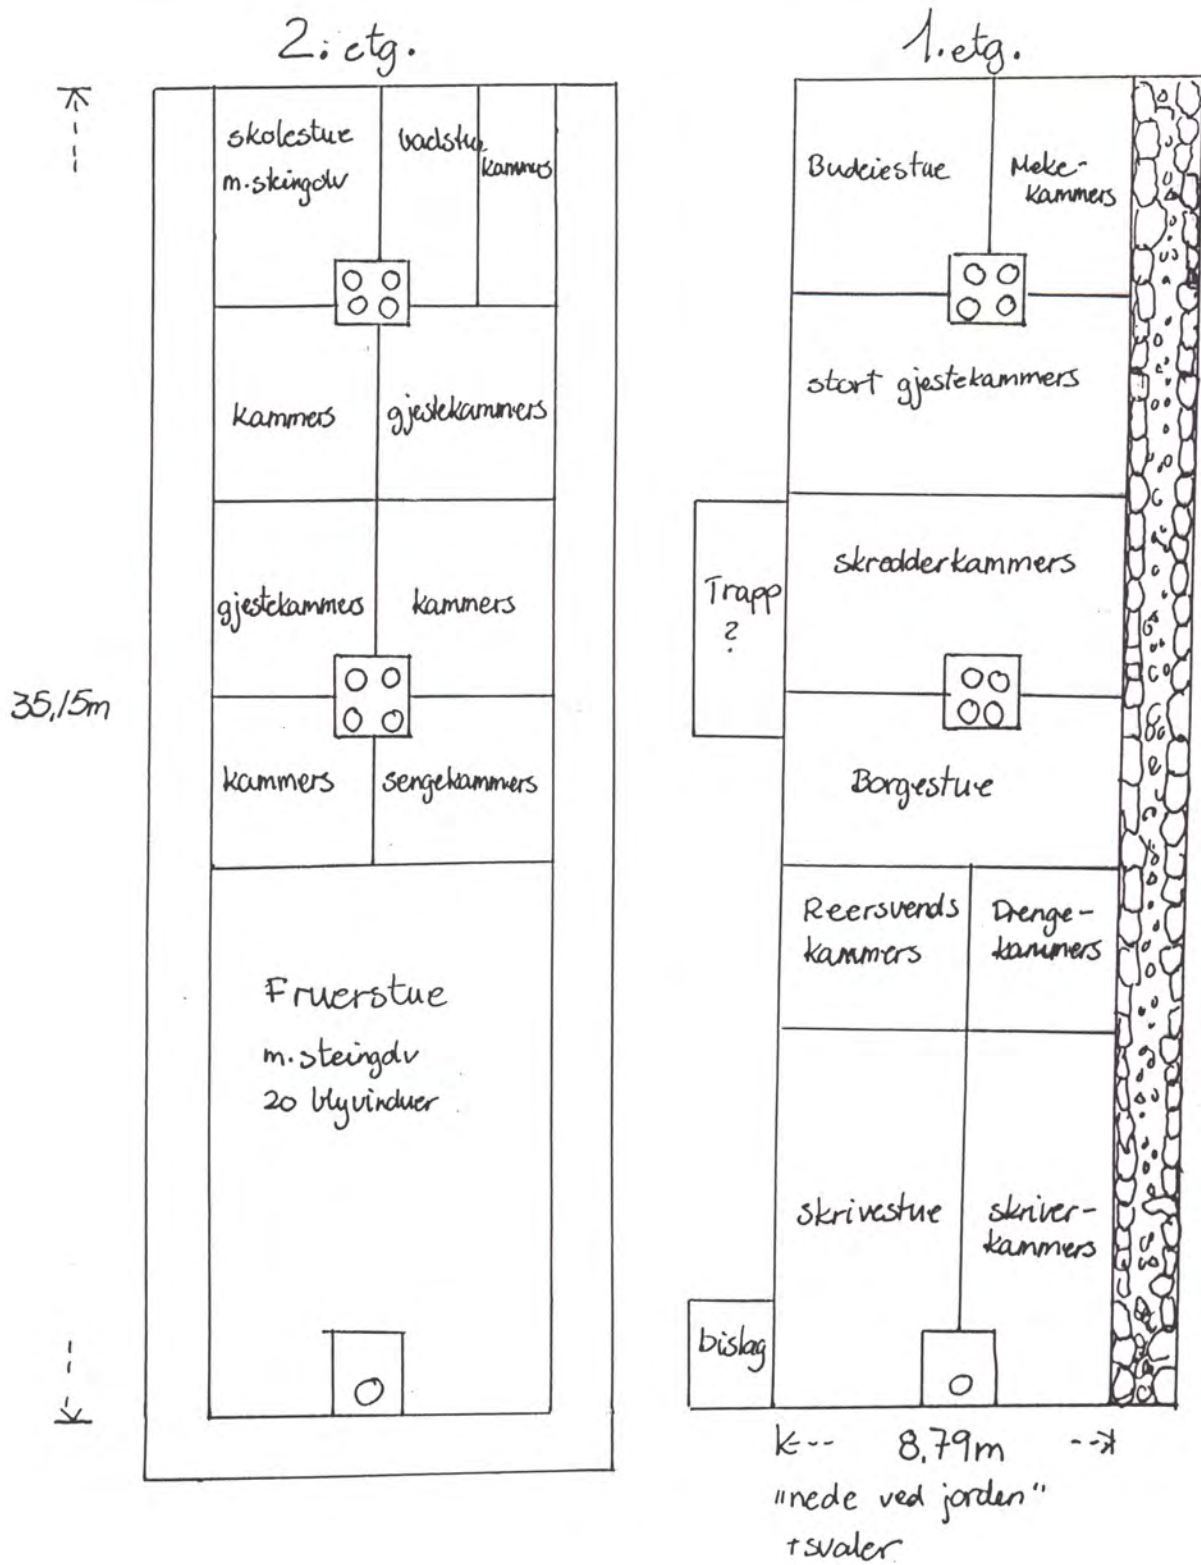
Schematic reconstruction of Herrehuset's internal layout (ground floor to right).
